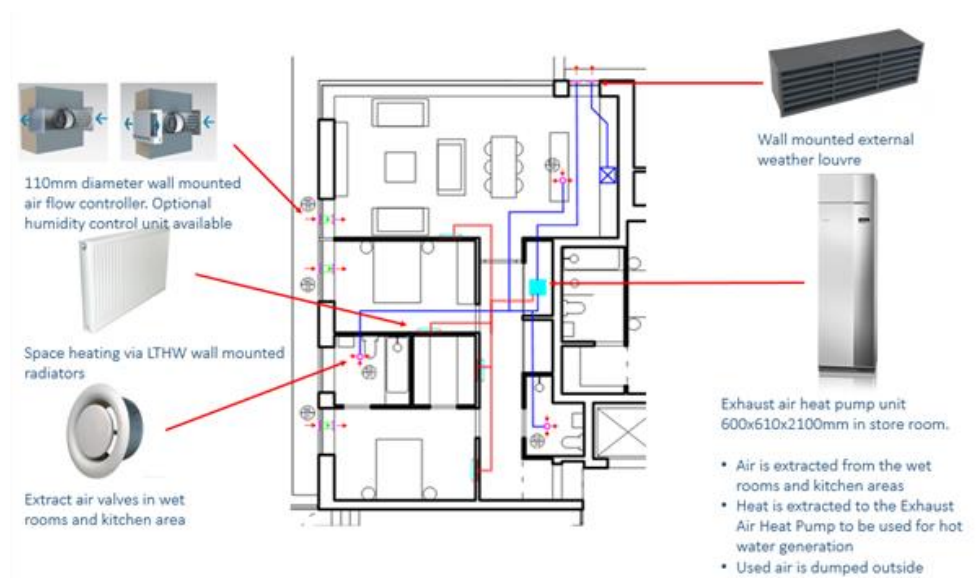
Example Diagram of Typical Exhaust Air Heat Pump Layout
